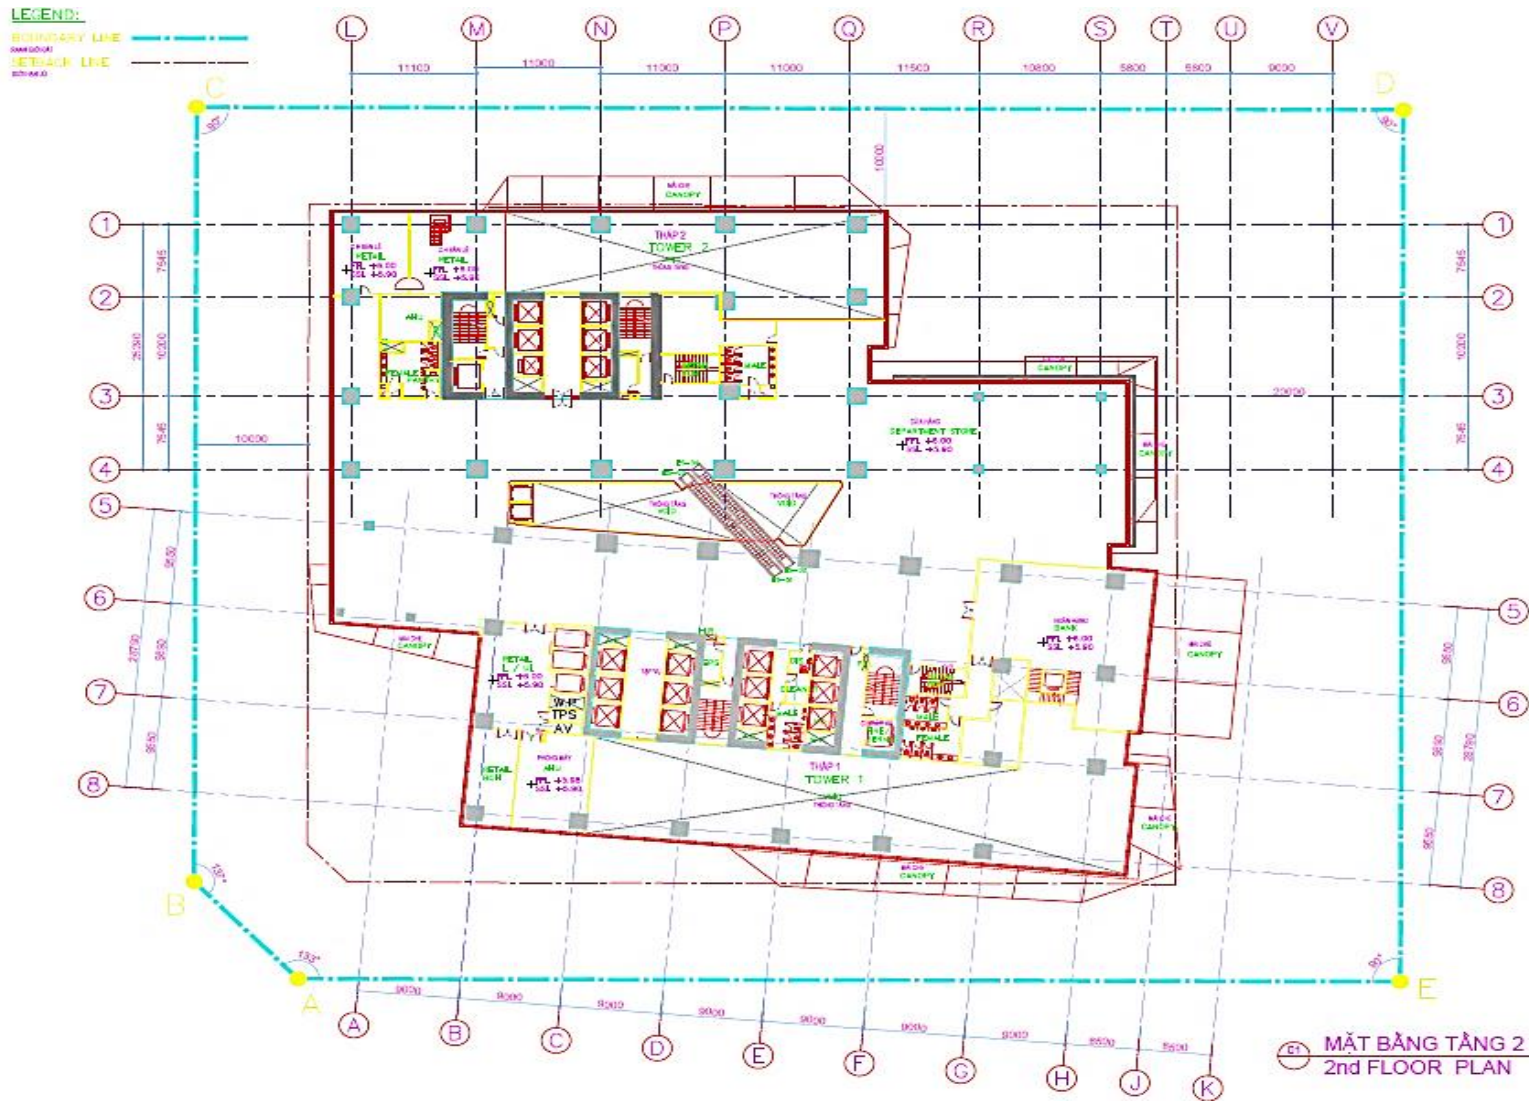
Typical floor plan from 2<sup>nd</sup> to 8<sup>th</sup> story
